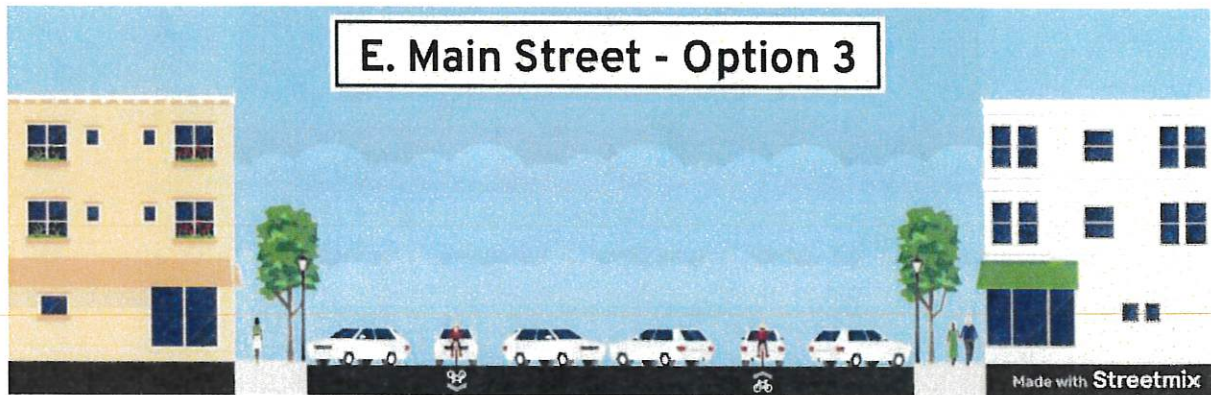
Downtown Streetscape Alternate Layout - Option 3
